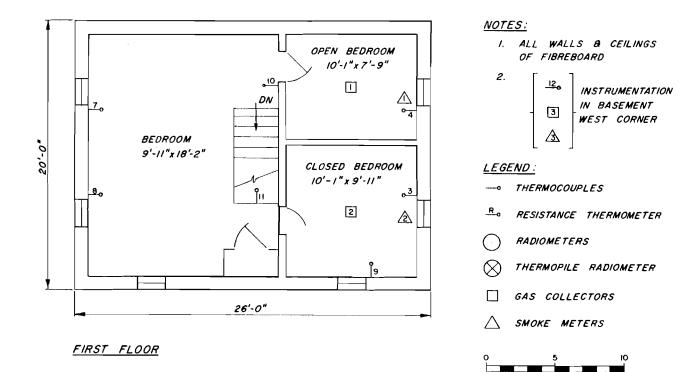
BUILDING No. 3 - TWO - STOREY SOLID BRICK DWELLING
